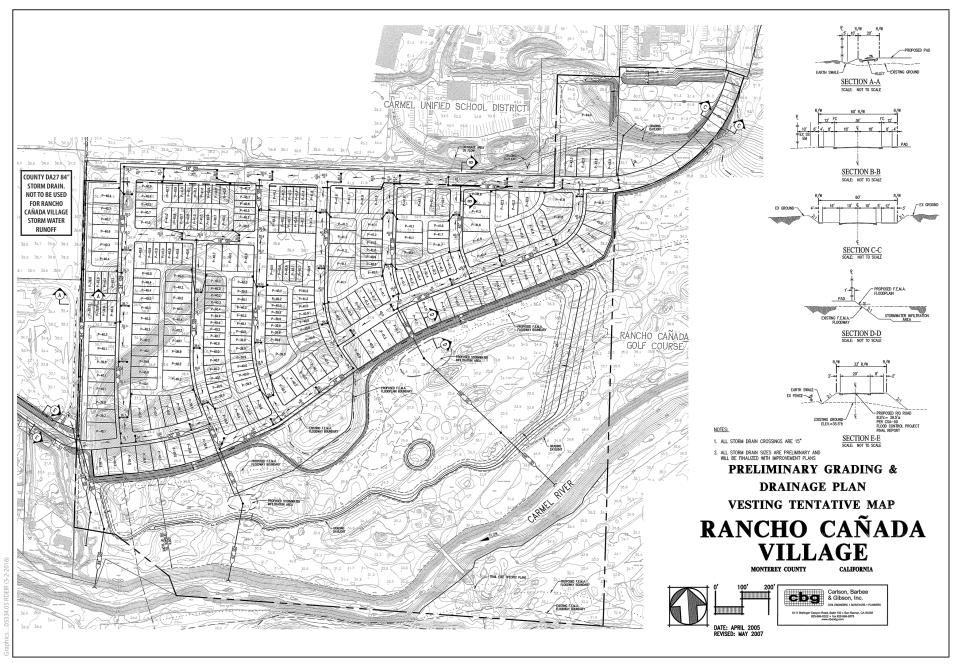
Proposed Project Preliminary Grading and Drainage Plan
